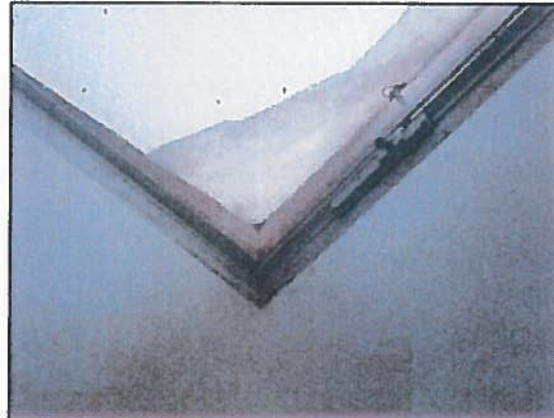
Fire Station 1 – Interior damage from water intrusion around skylight
